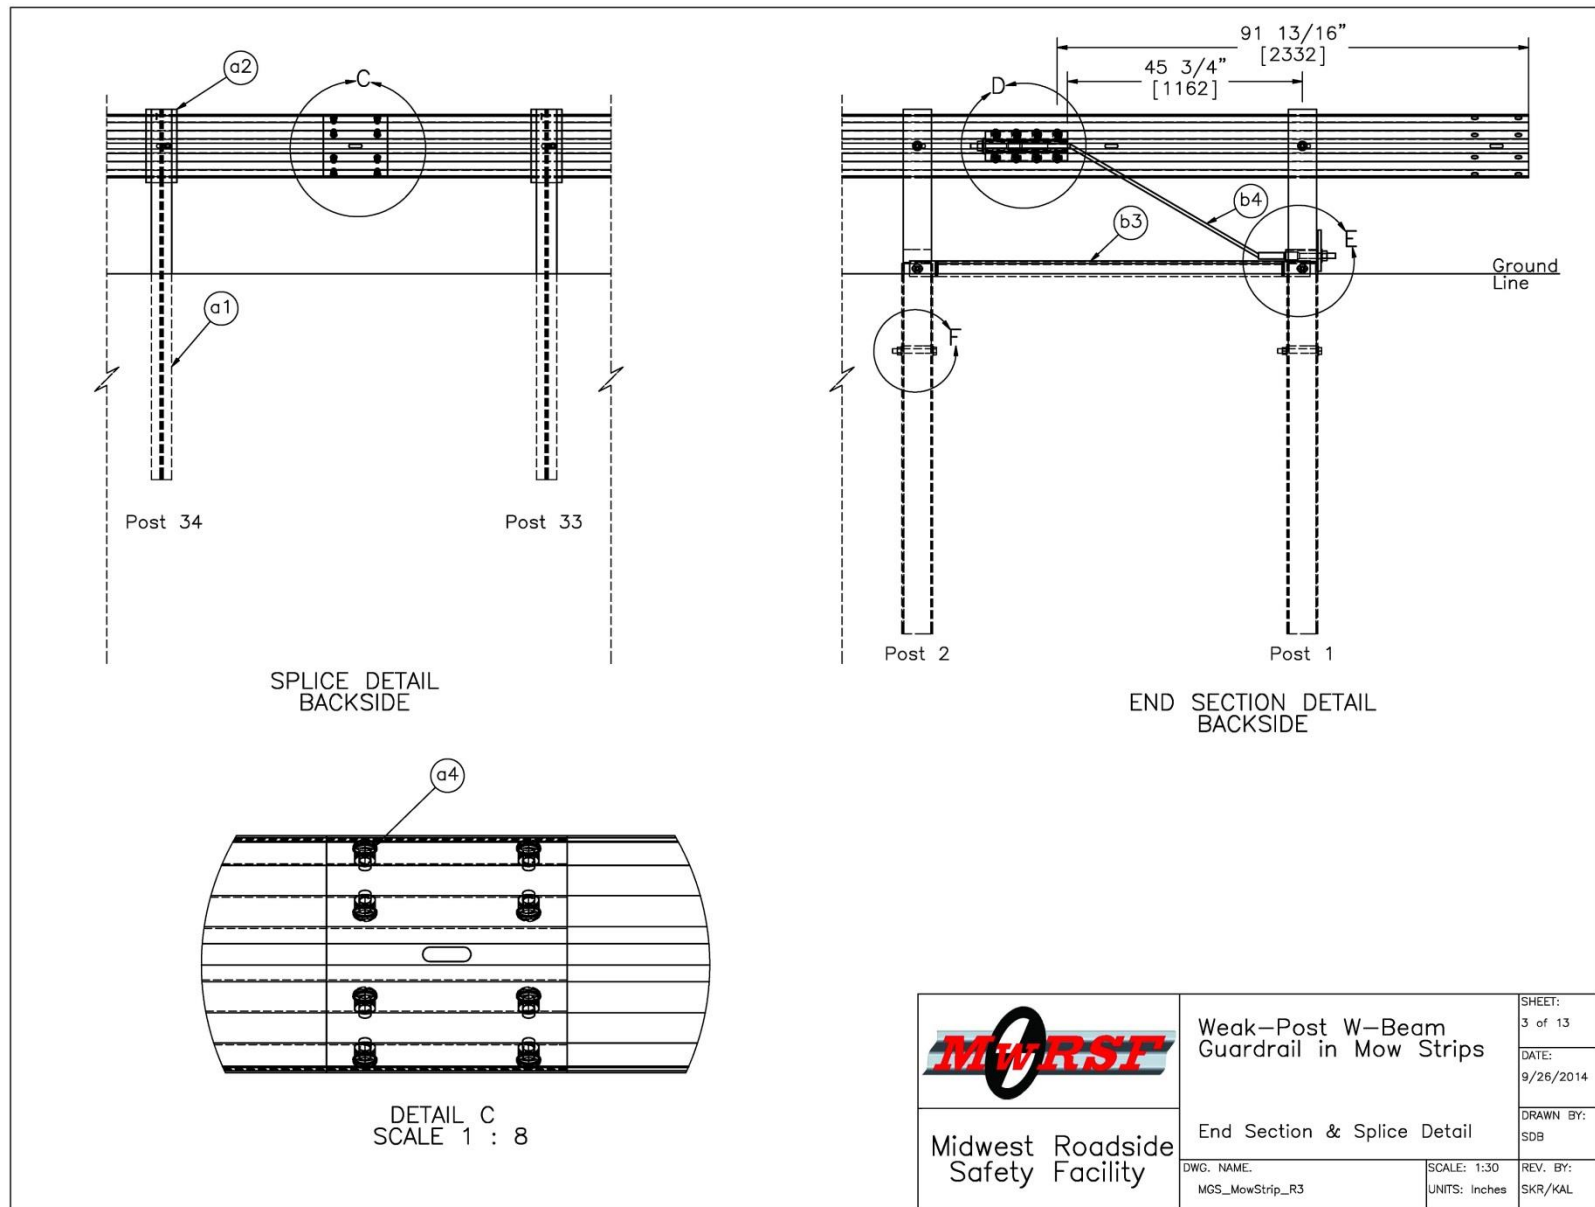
Anchorage and Splice Details, Test No. MGSMS-1
